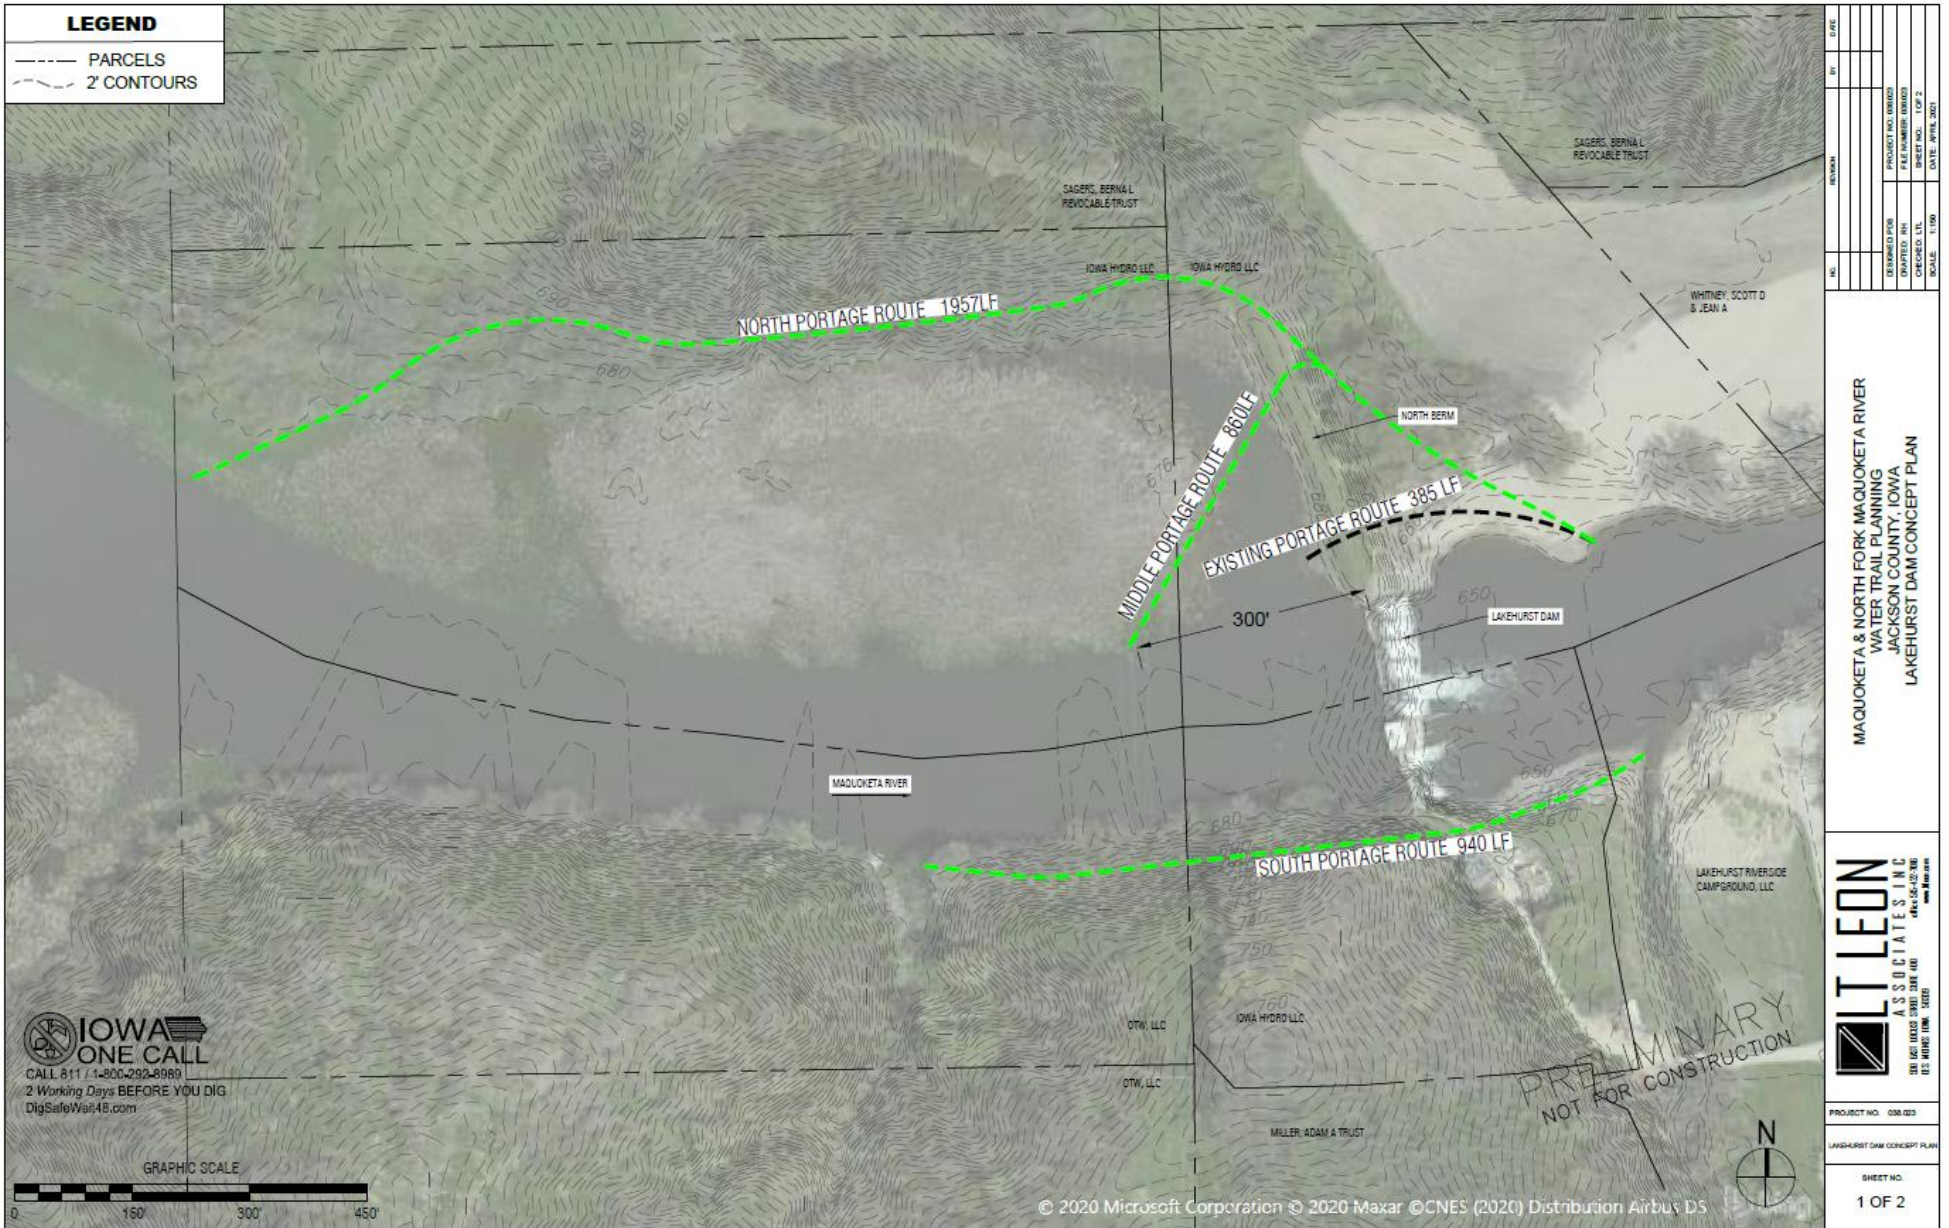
LAKEHURST DAM CONCEPT PLAN
